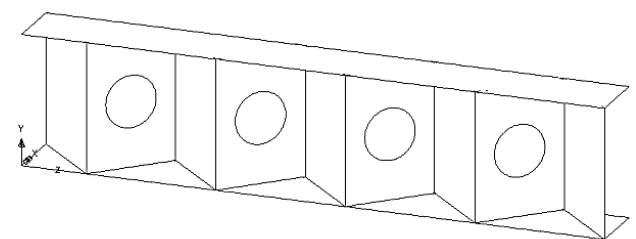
The isometric view of TriWP with perforation of circular shaped arranged in Layout 3
